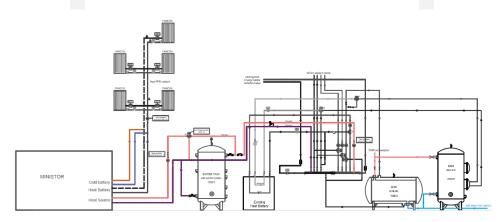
Hydraulic connection scheme for the MiniStor system to the G2 building's HVAC system.
